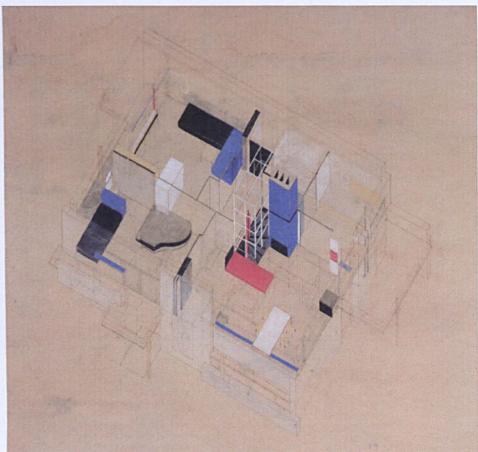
House at Utrecht above: the exterior; right: plan of the first floor showing the use of sliding screens to create separate rooms. De Stijl architect, Gerrit Rietveld - Schöder House 1924
